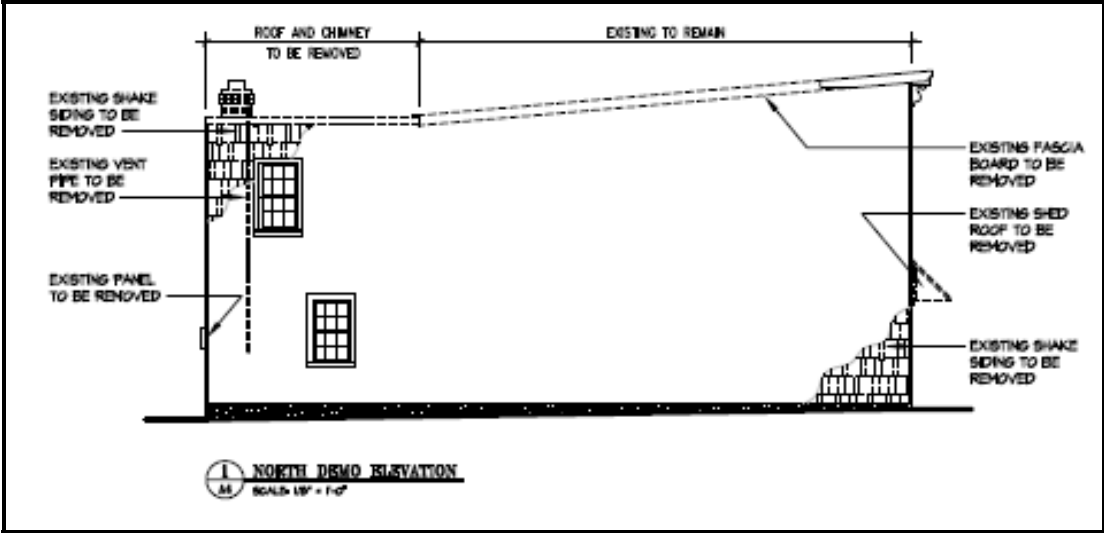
Existing north elevation showing areas of encapsulation/demolition.
